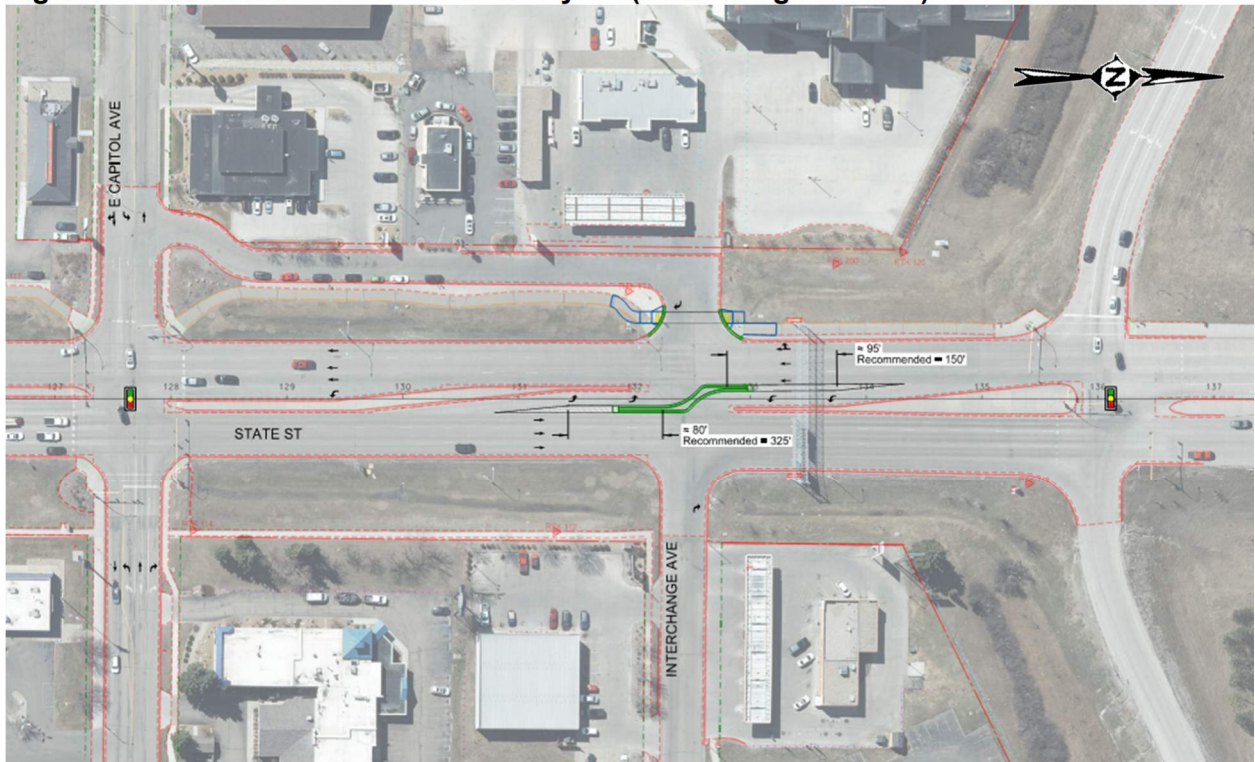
Alternative B: Intersection Layout (Capitol Avenue)
